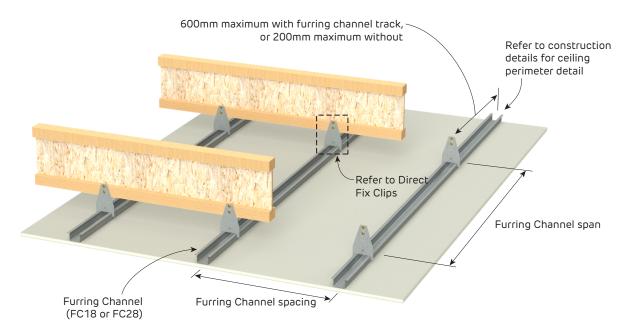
Direct Fix Furring Channel Ceiling Frame
